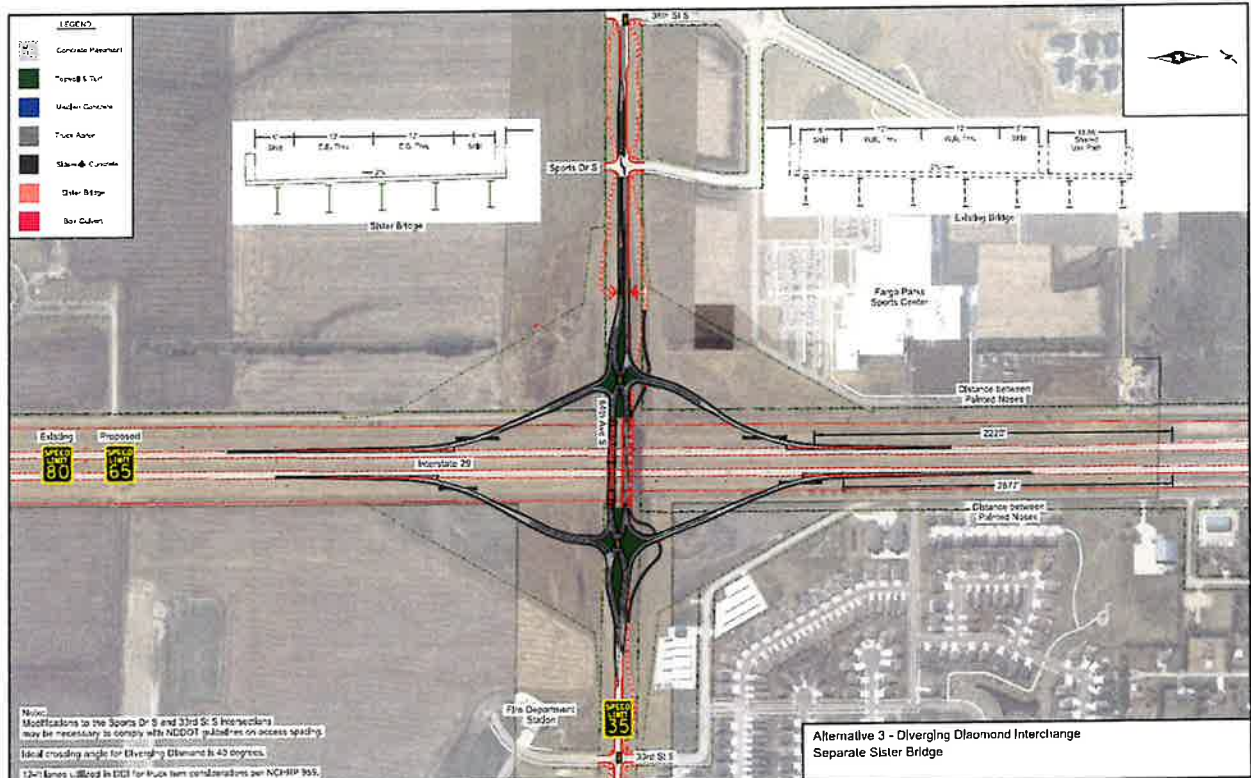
Alternative 3 Proposed Layout & Typical Section
